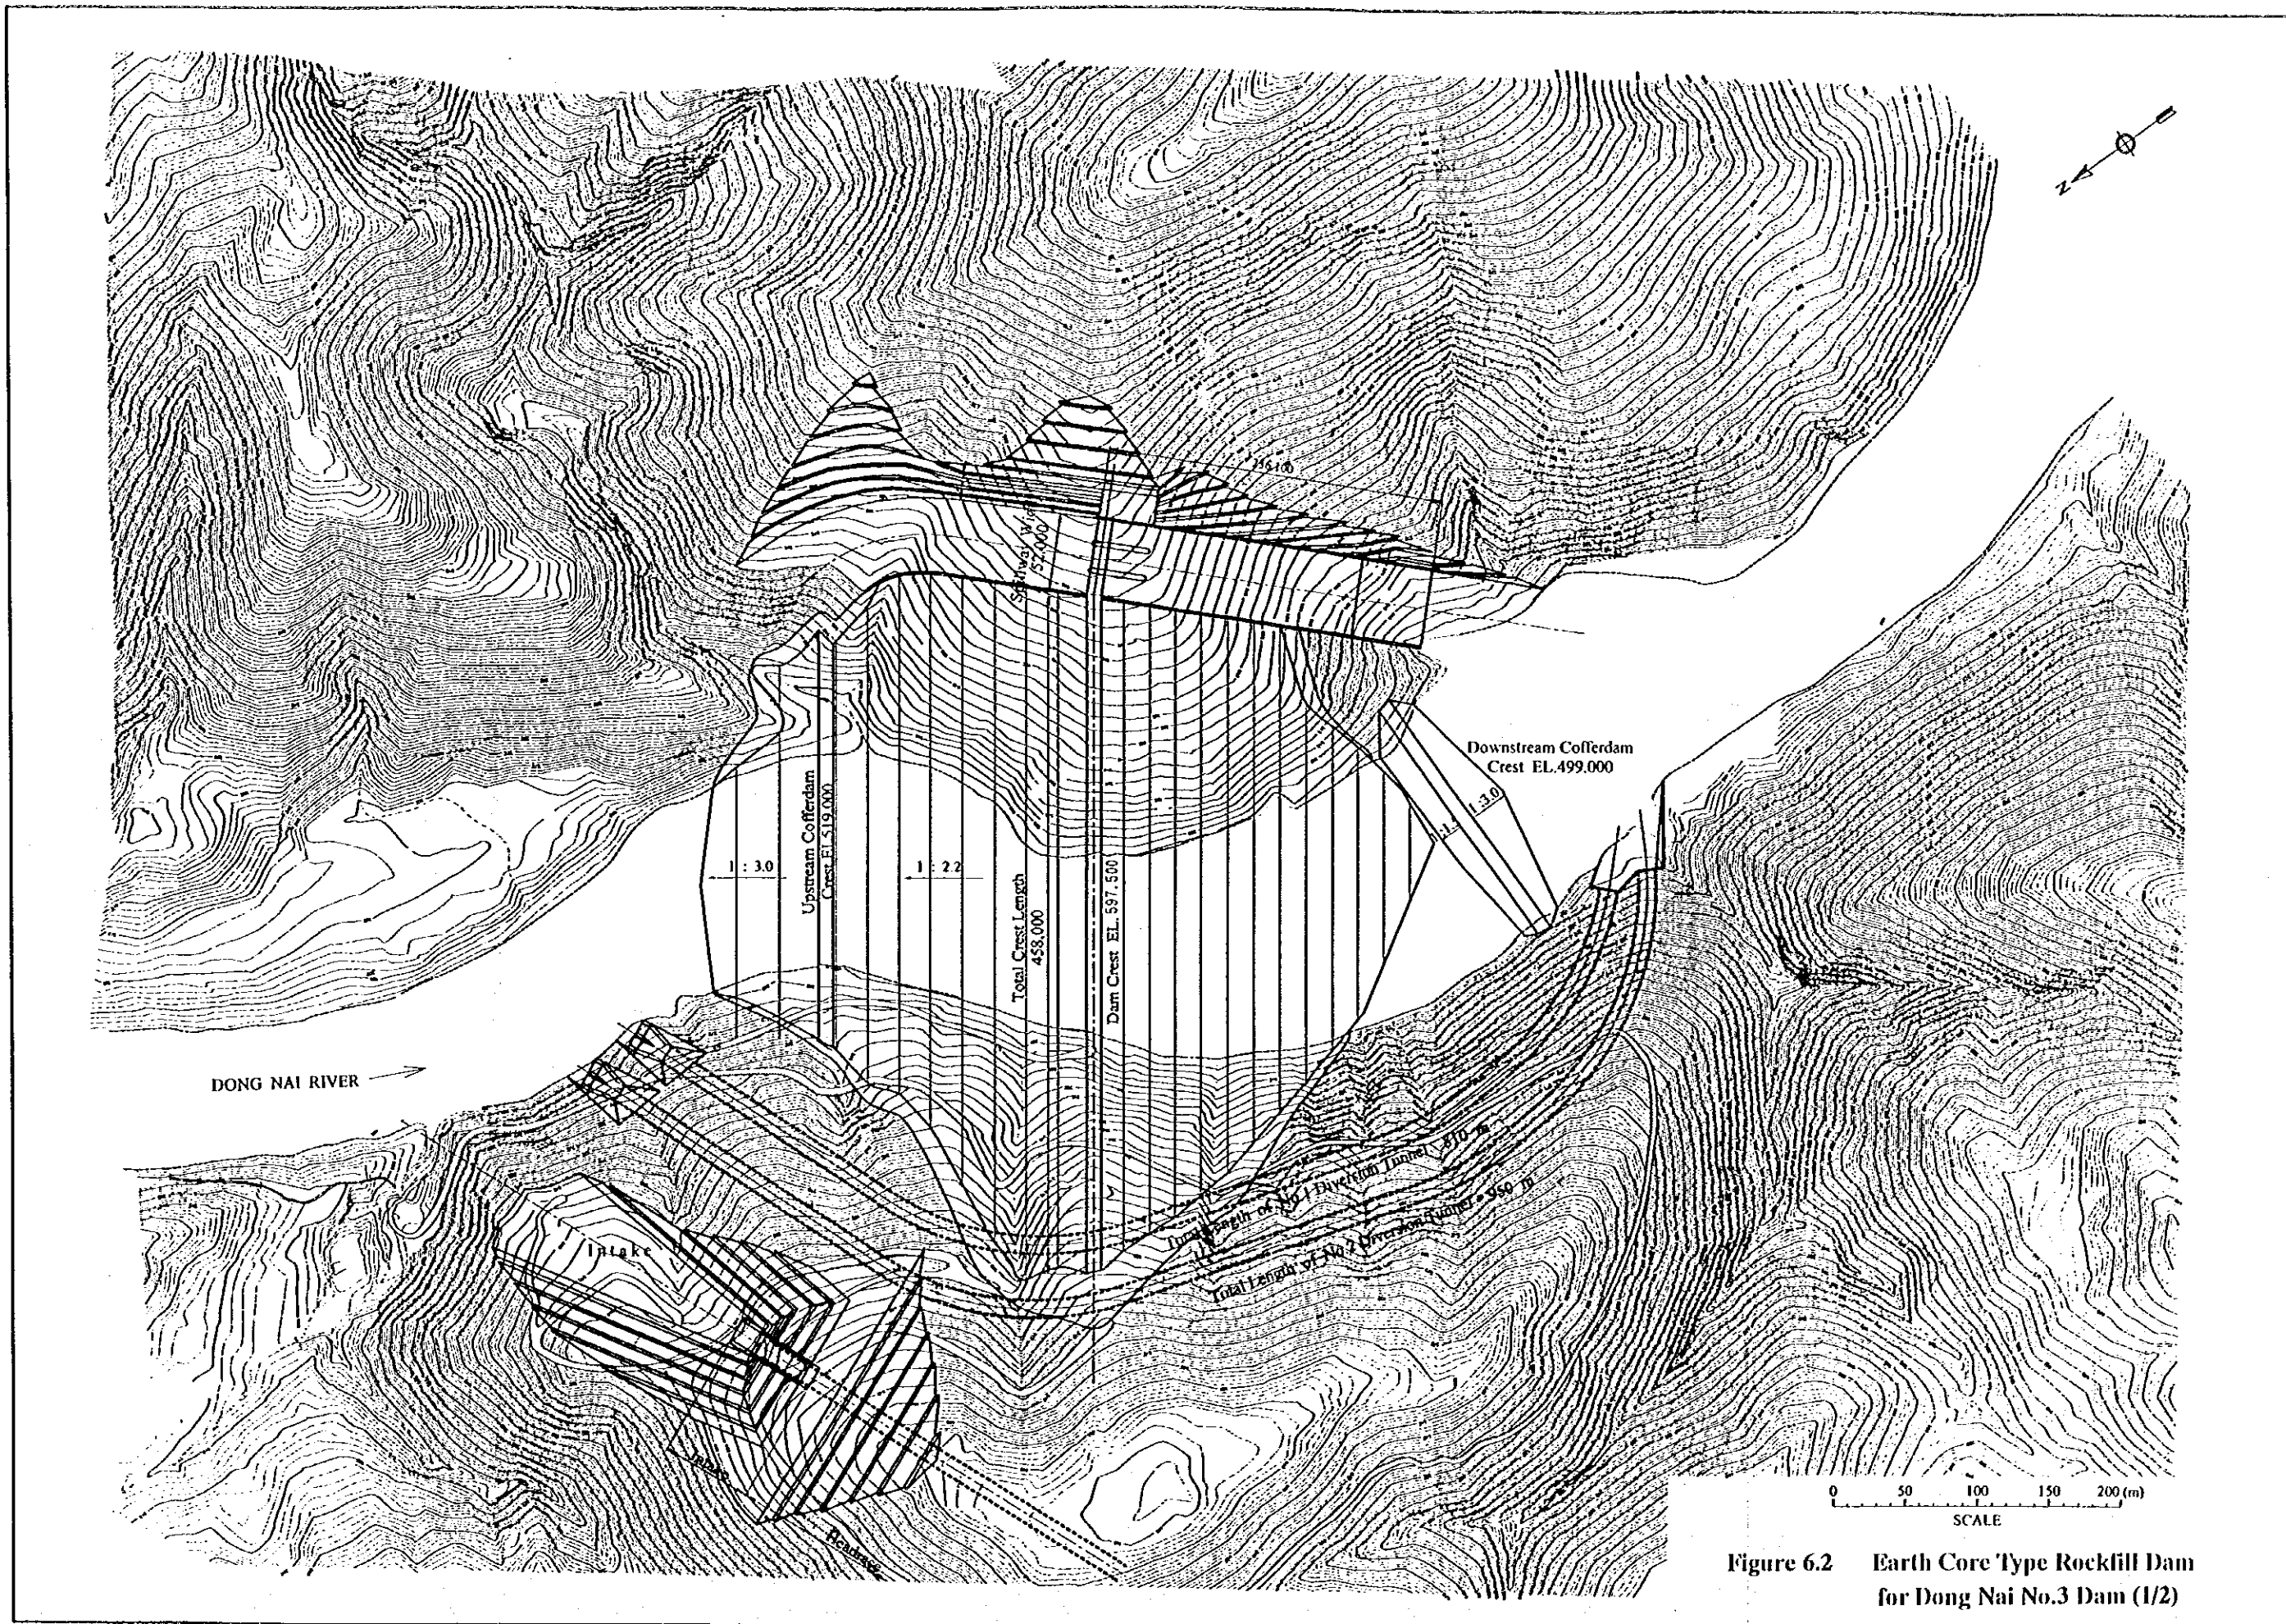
Earth Core Type Rockfill Dam for Dong Nai No.3 Dam (1/2)
